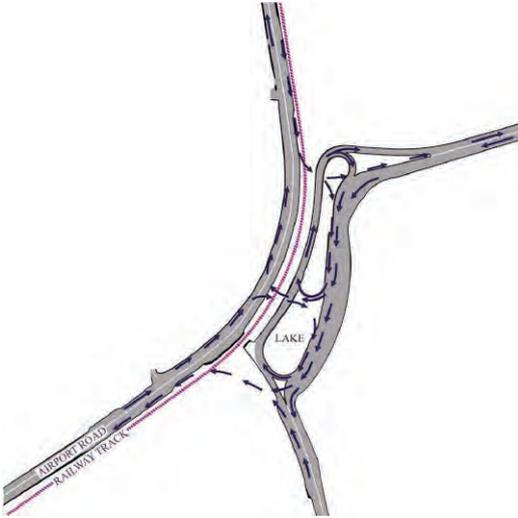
Elongated ‘roundabout’ with connecting ground and aerial routes
